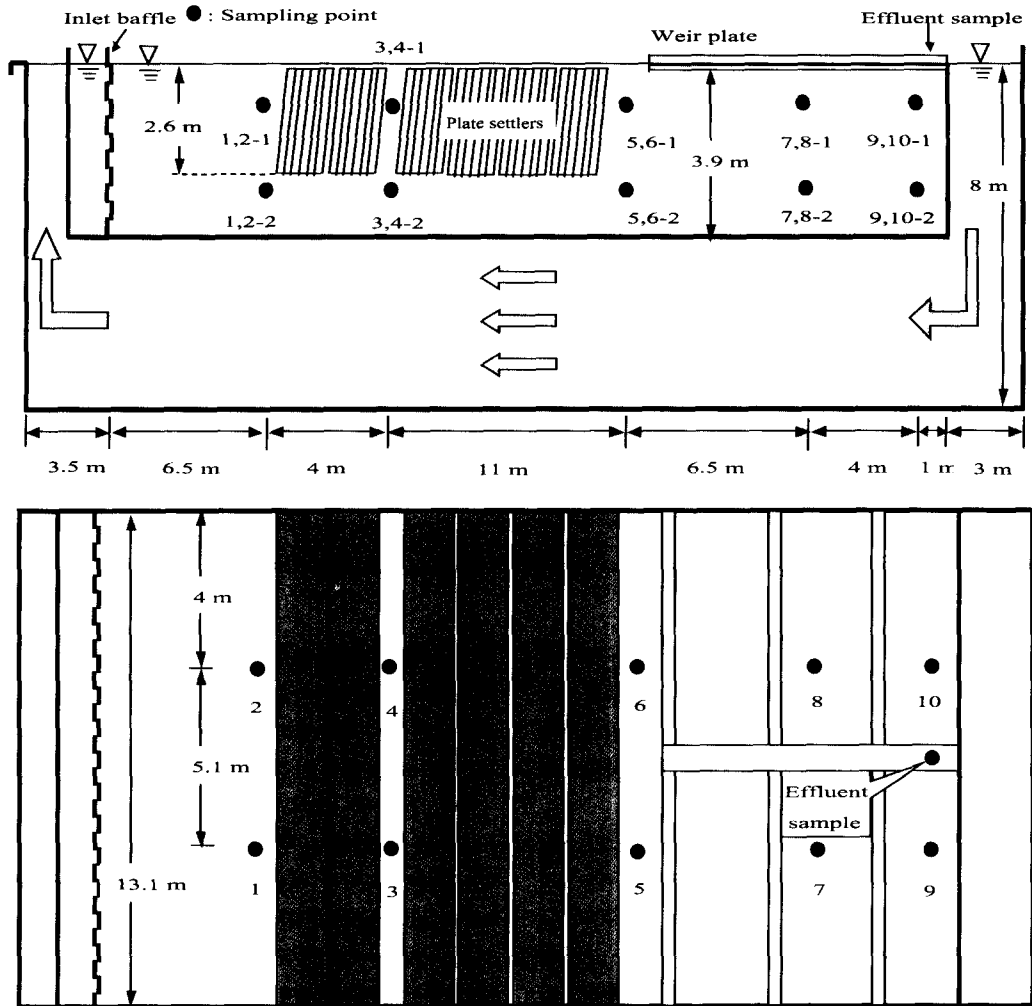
Elevation and plan of settling basin and sampling points (BG plant).
